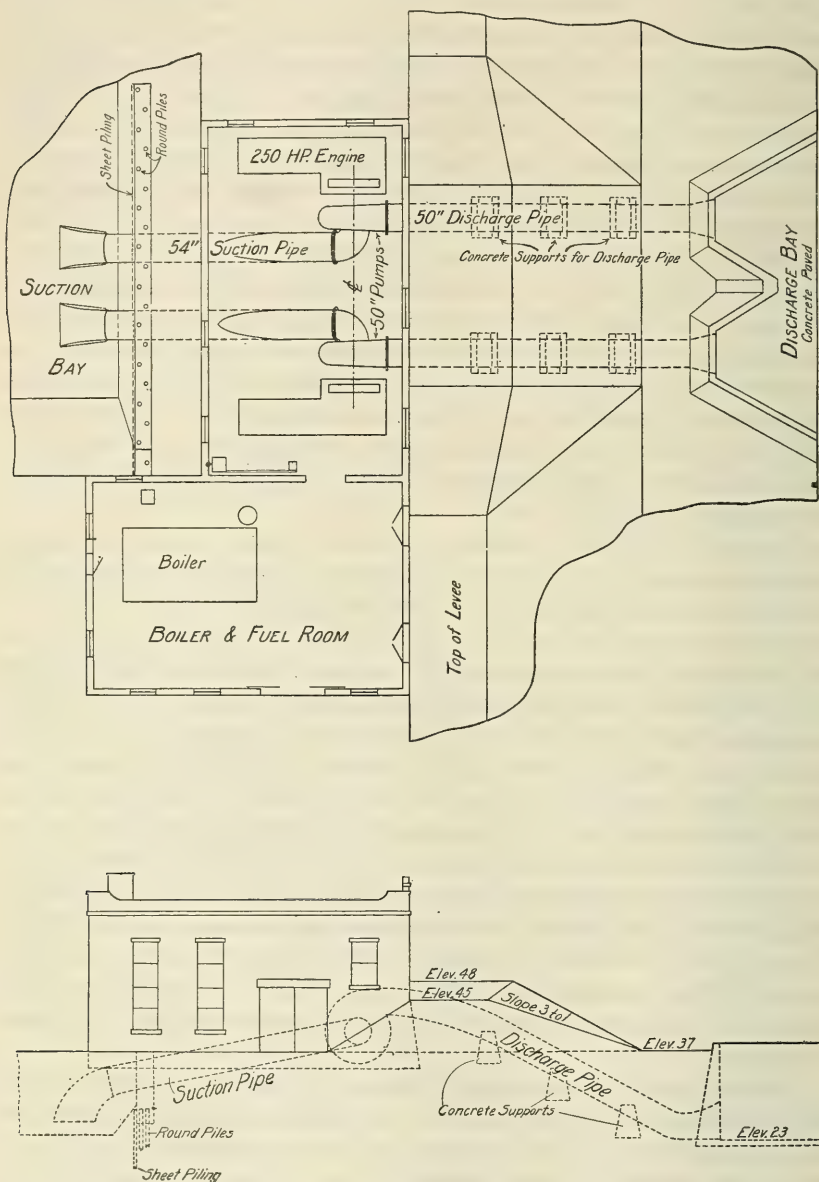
Plan and elevation of pumping plant, Louisa-Des Moines Drainage District No. 4, Iowa.
